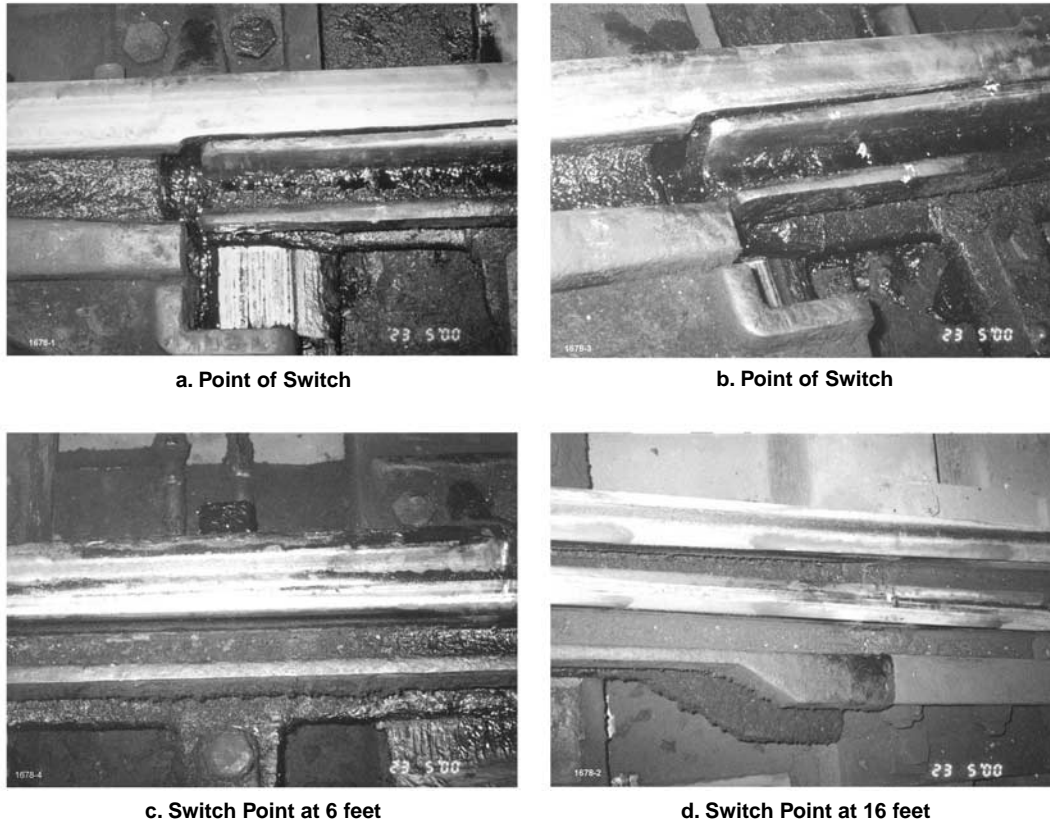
Erie Avenue switch inspection: point of switch (a and b), at 6 feet (c), and at 16 feet (d).
